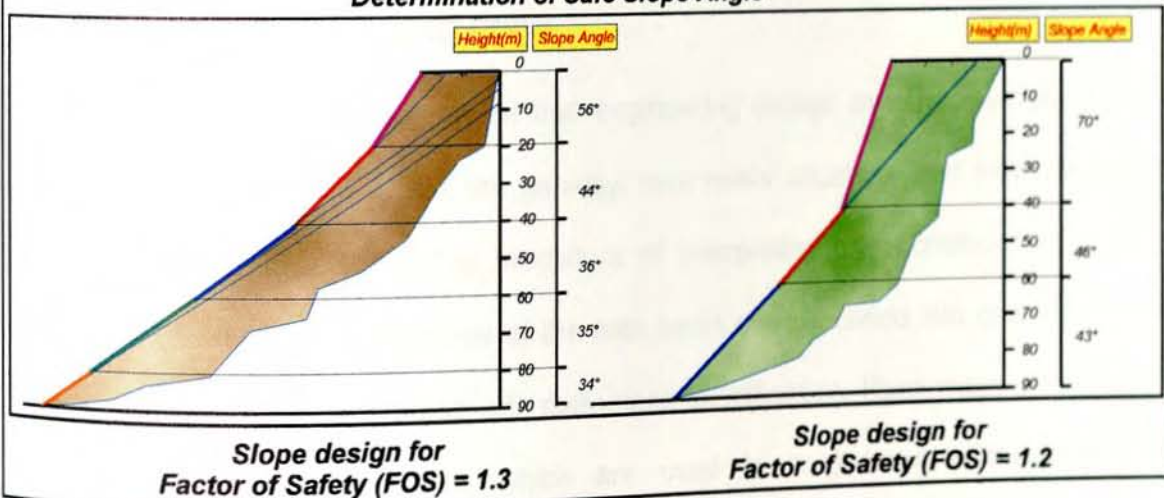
Section Line SL 4A slope design based on plane failure mode.
